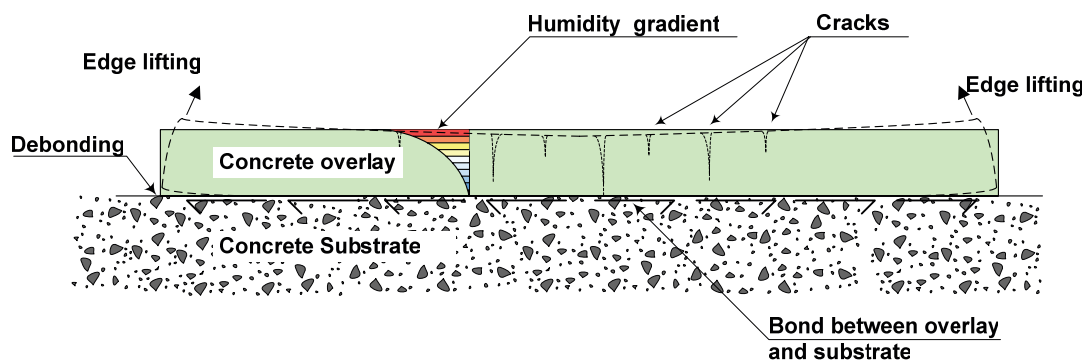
Cracking, debonding and edge lifting in concrete overlays as presented in Carlswald (2006).
